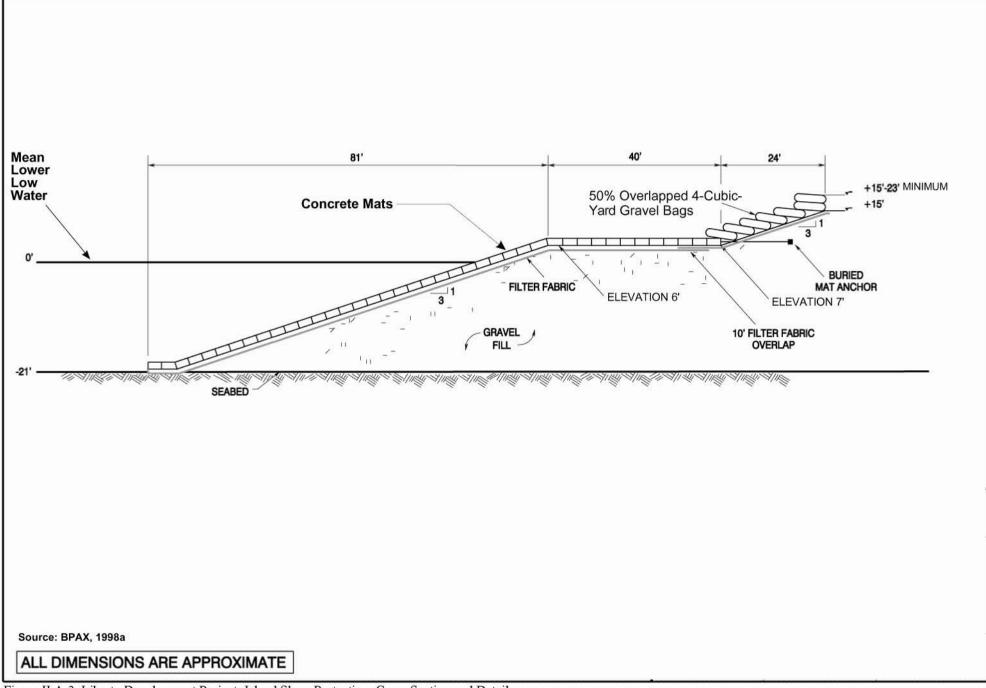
Liberty Development Project: Island Slope Protection, Cross-Section and Details
